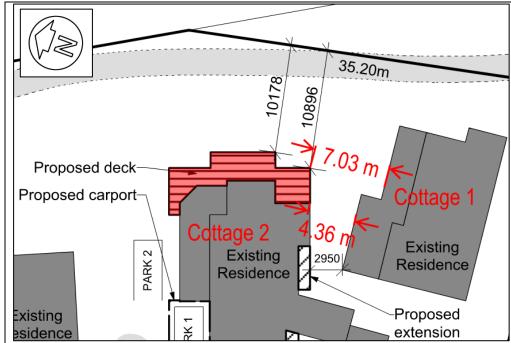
Setbacks of the proposed Cottage 2 deck from the existing Cottage 1 deck areas
